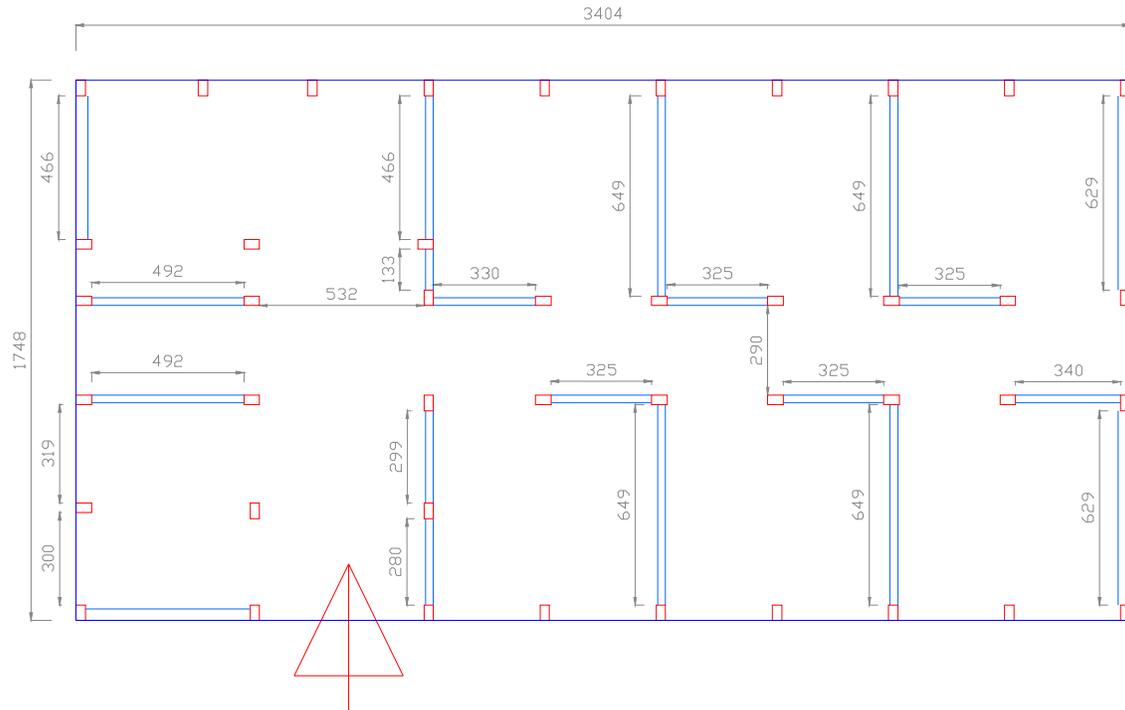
Typical school plan without shear walls. All the walls shown in the drawing refer to those occupying a full span. Walls with openings are excluded. All the columns have dimensions of 0.3m x 0.5m. The arrow indicates the entrance to the building. Dimensions are in cm.
